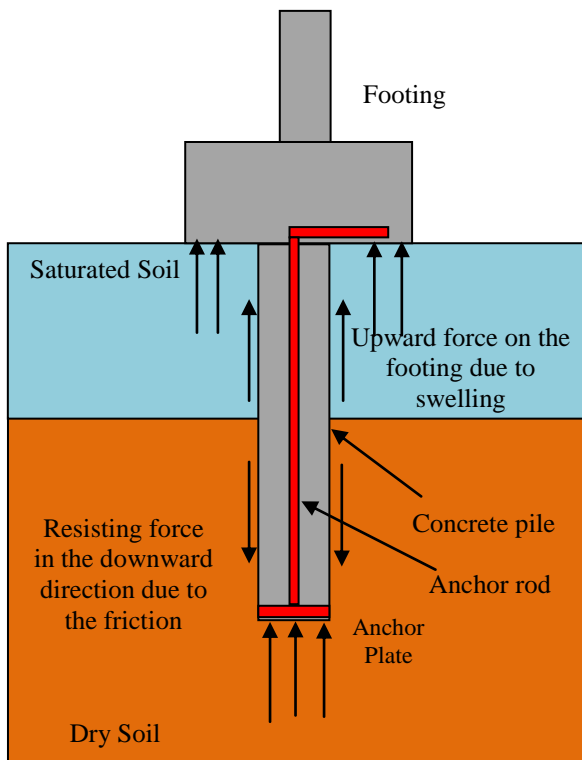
Concept of concrete pile anchor foundation (CPAF) system
